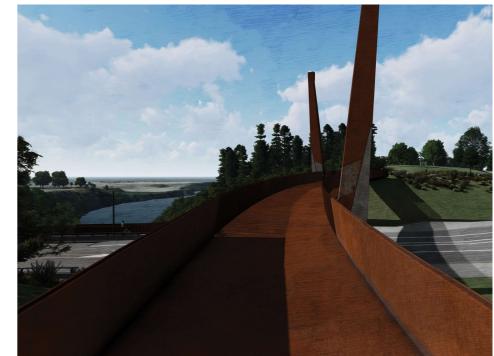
illustrates the pedestrian bridge and the elegant structure that provides a seamless link across the Ring Road Extension, while providing views across the Waikato River and landscape beyond.
